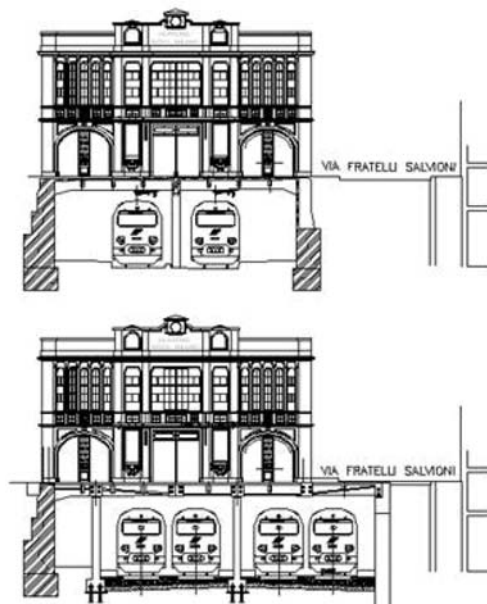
Structural scheme evolution of building bridge railway station by external pre-stressing and more than 30 construction stages.
